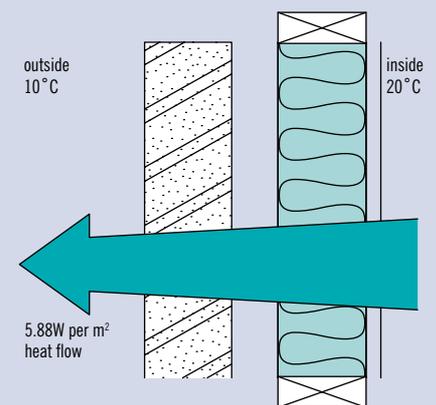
Heat transfer through R1.7 insulated brick veneer wall
